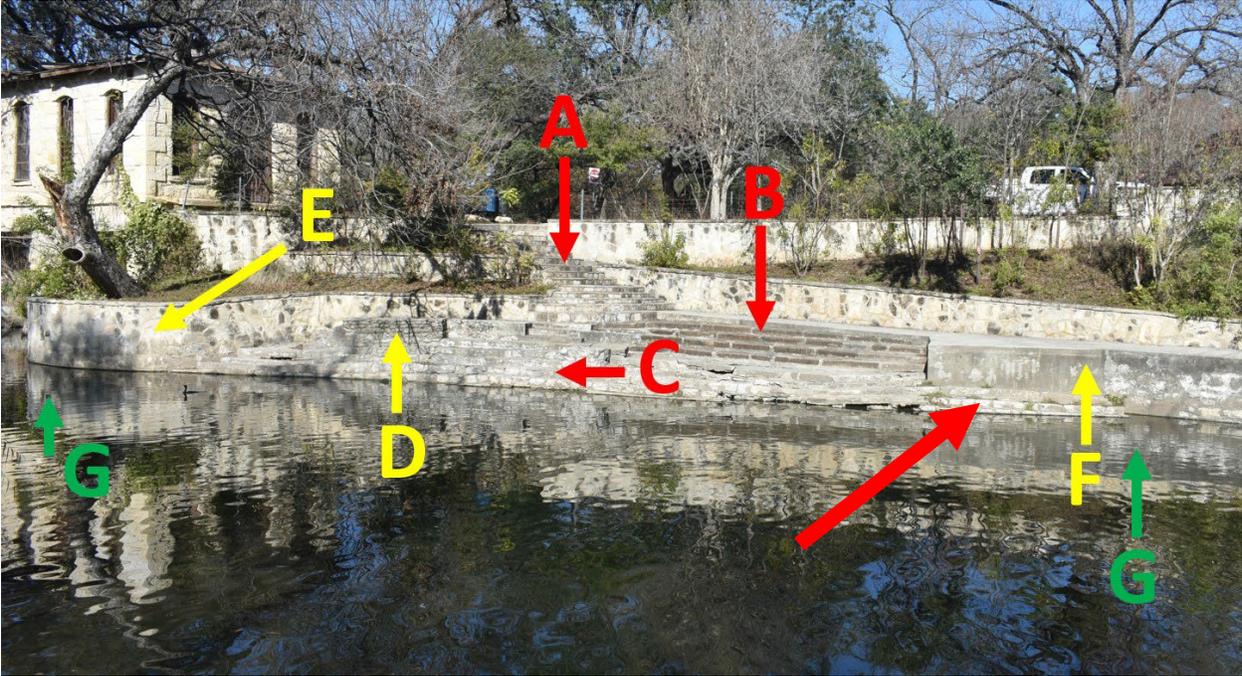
Resource B1-2 construction phases as annotated by CMEC. Sections A, B, and C are different construction phases related to the staircase. Section D is a small platform, Section E is a repositioned retaining wall, and Section F is a walkway and platform modified in 2002. Section G indicates the approximate extent of Section C's submerged portion. Photograph by CMEC, 2022.
